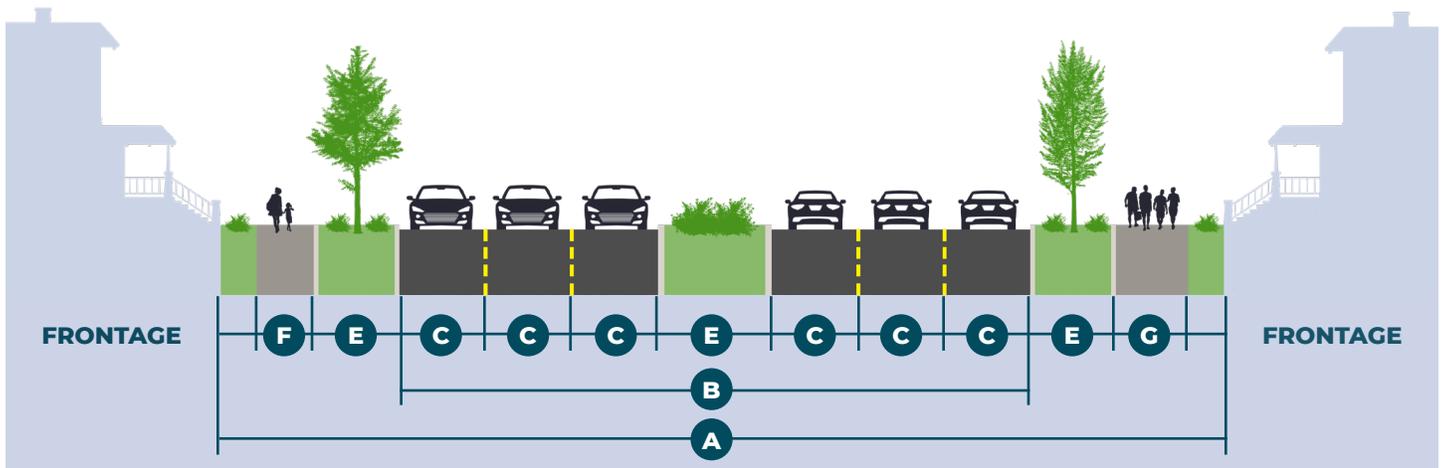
Standard Arterial (Minor Arterial or Major Arterial)
